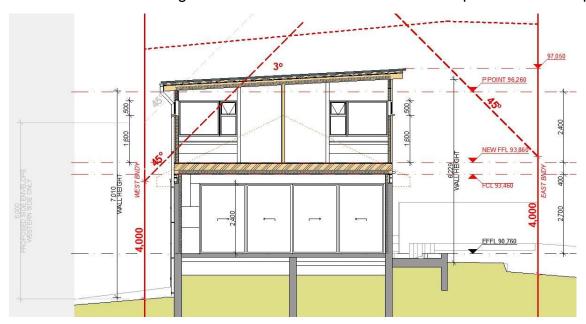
Cross Section S2: Encroachment to Western Side Boundary Envelope
